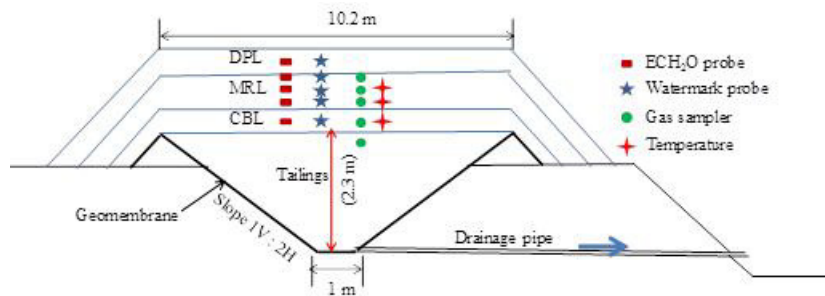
Schematic section of a typical experimental CCBE (not at scale) and the installed monitoring equipment
